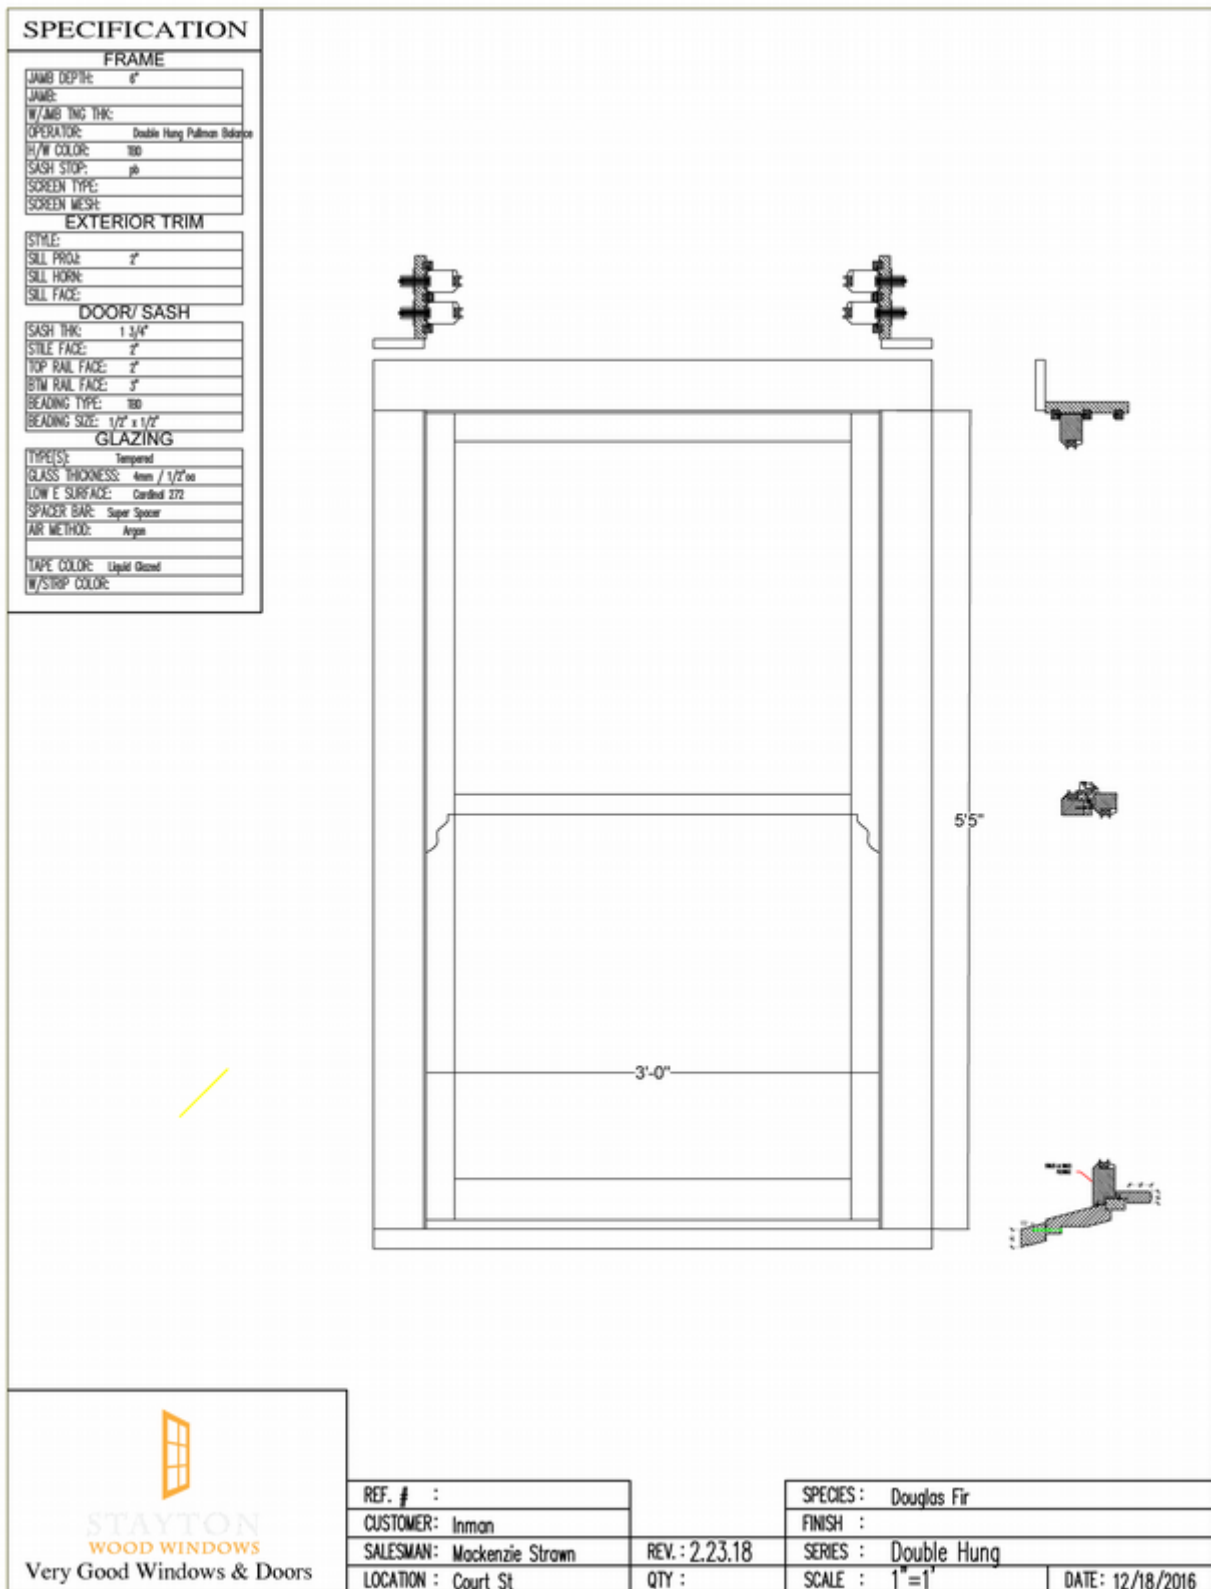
Back Bedroom Window - Stayton Windows Shop Drawing
